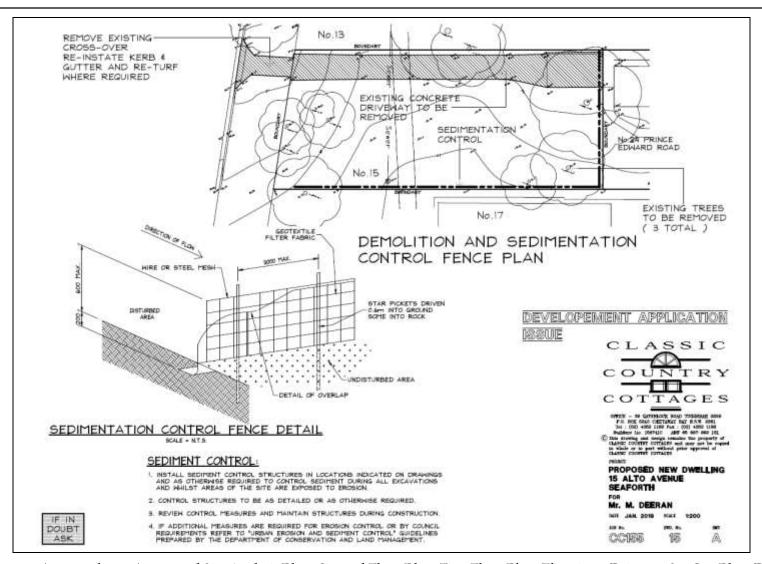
Illustrates (pages 8 thru 15) proposed Site Analysis Plan, Ground Floor Plan, First Floor Plan, Elevations, Driveway Set Out Plan, Demolition & Sedimentation Control Fence Plan.
